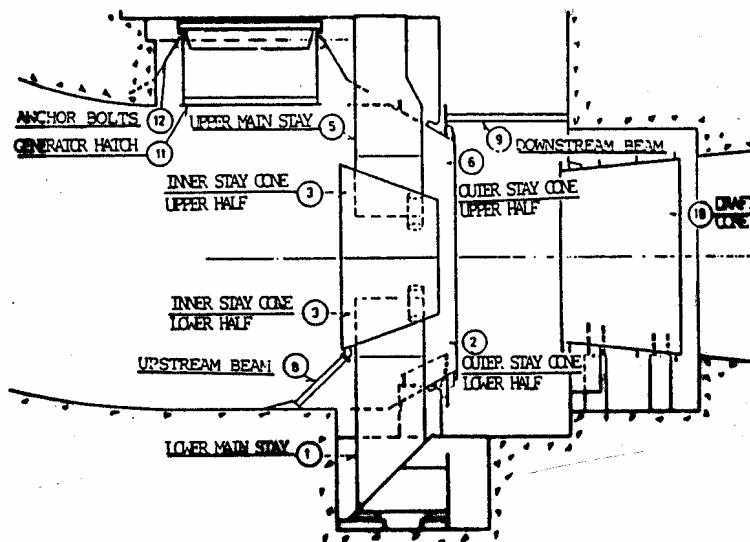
Stay cone and draft tube. Vertical section (Courtesy of Kvaerner Brug)
